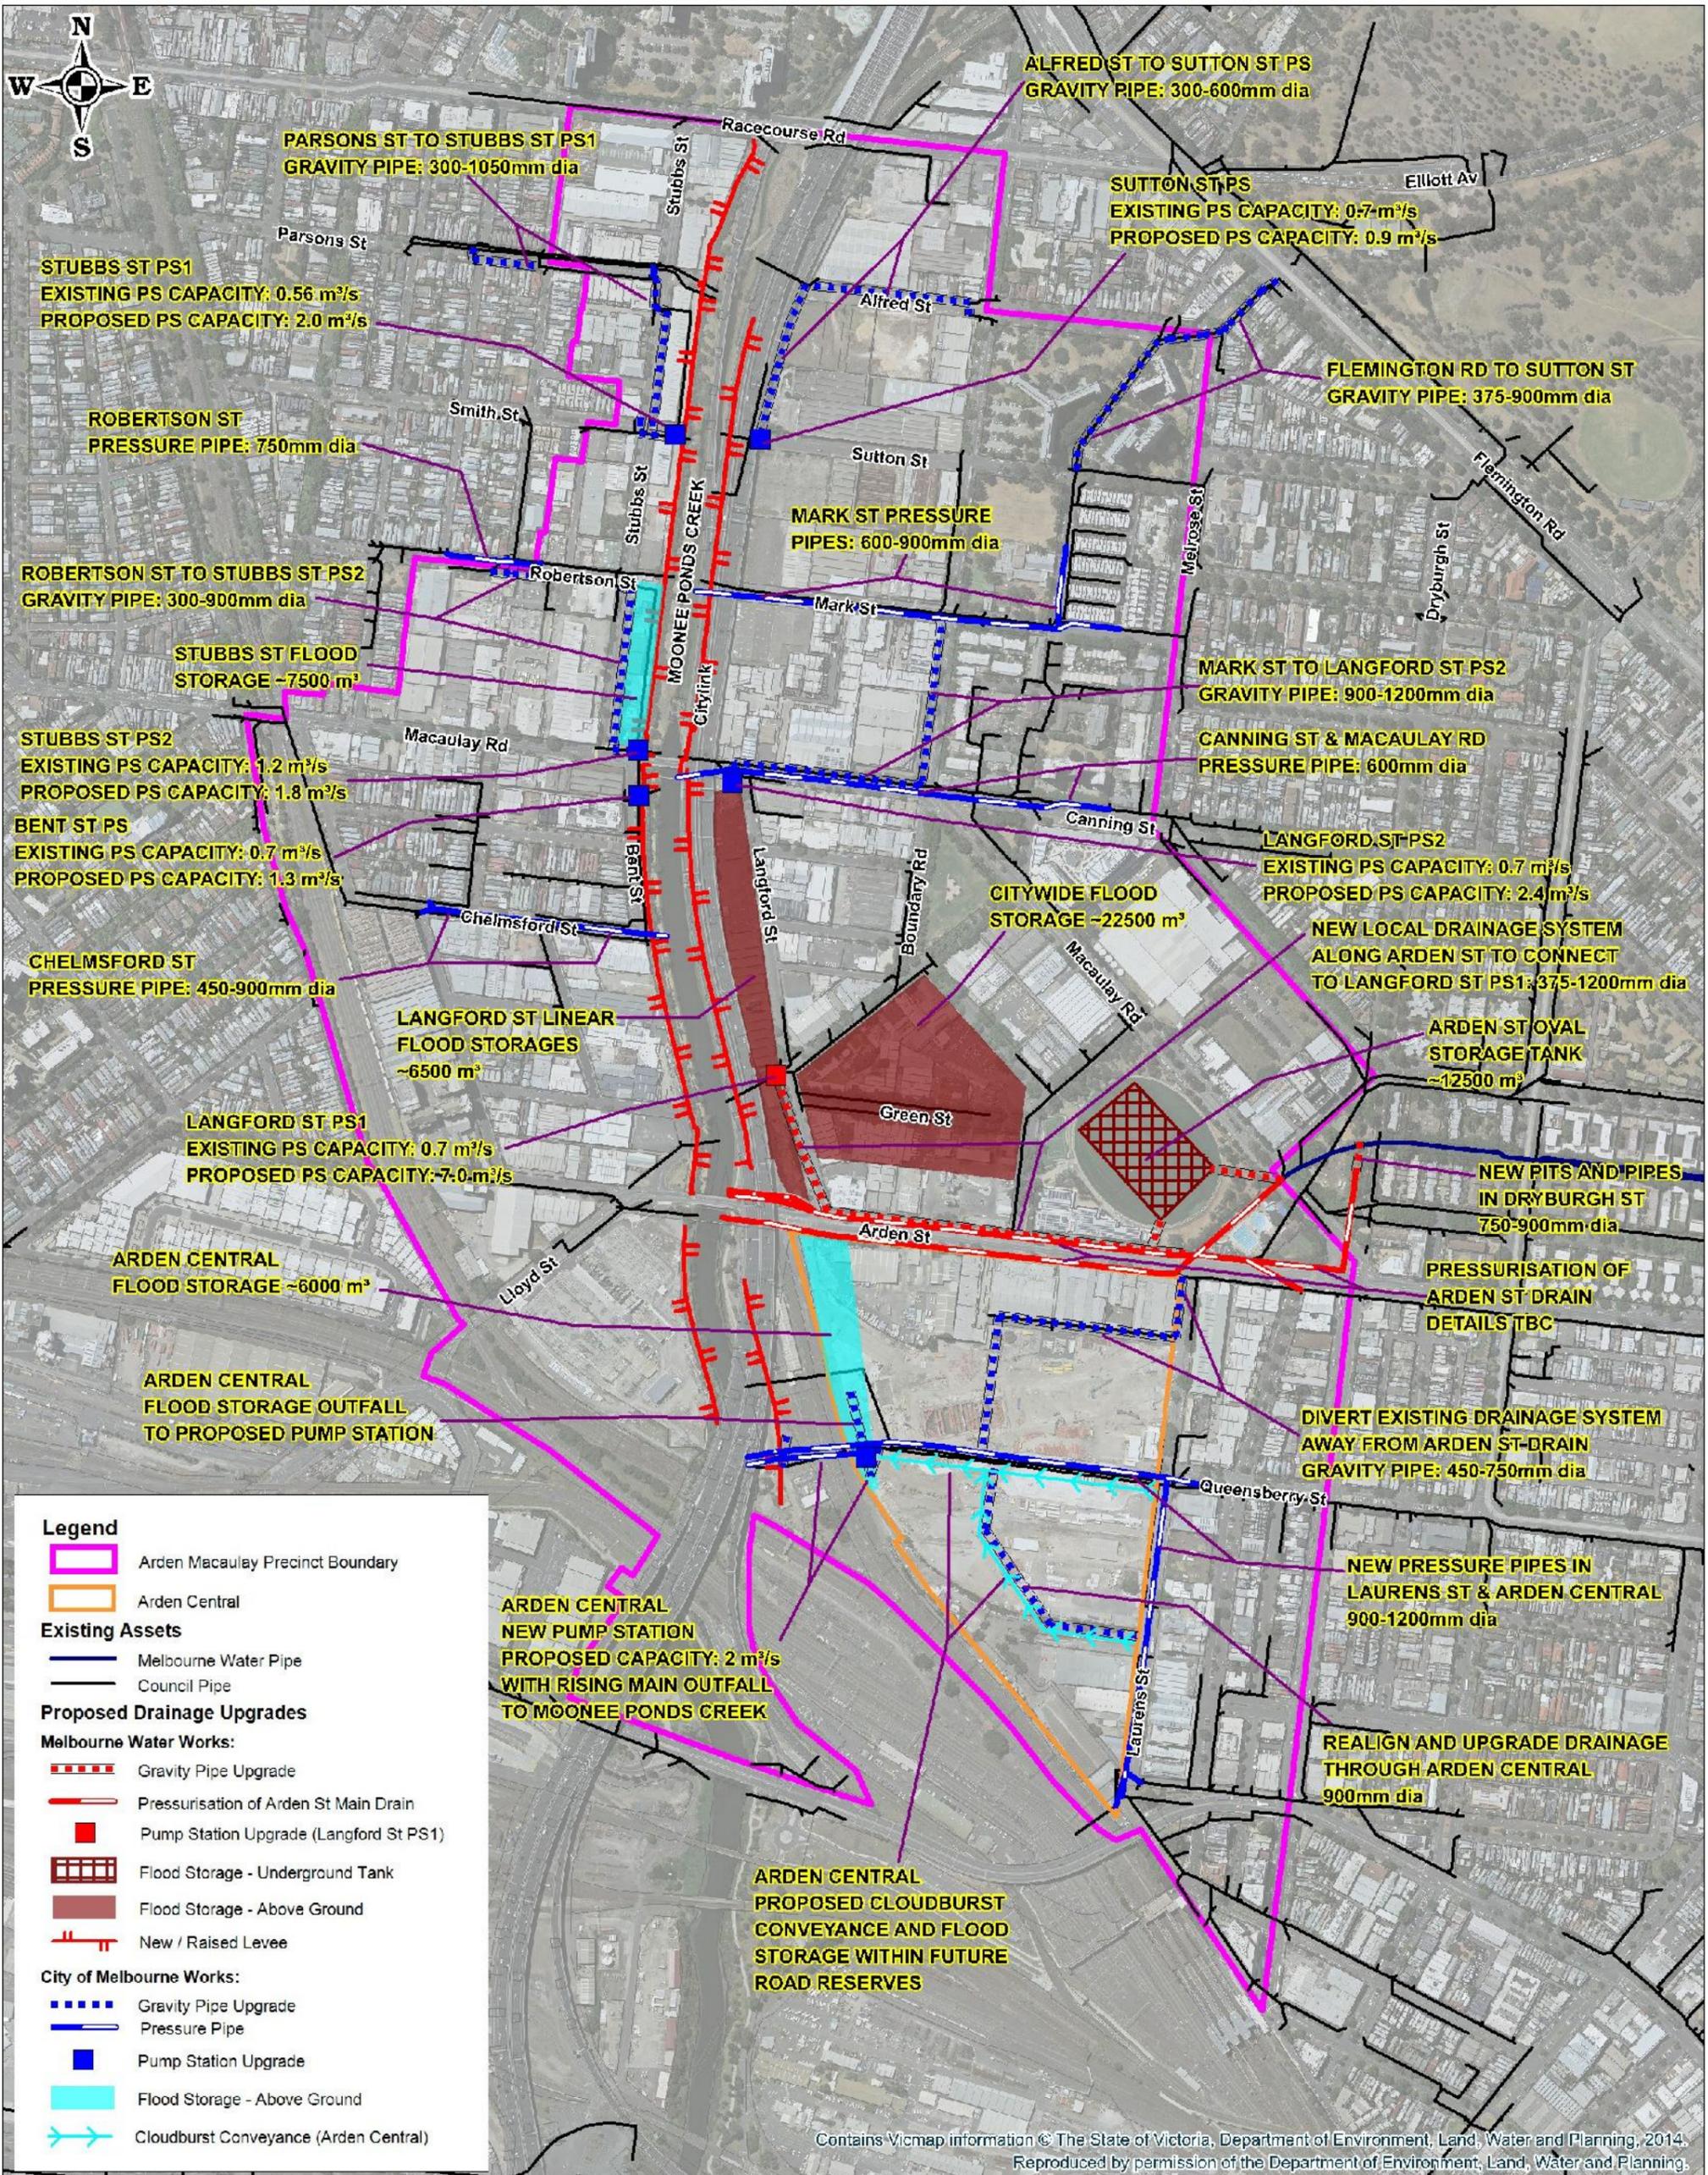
provides a layout plan showing the locations and key details of the working drainage strategy, including whether the drainage works will be owned and maintained by Melbourne Water or City of Melbourne.
